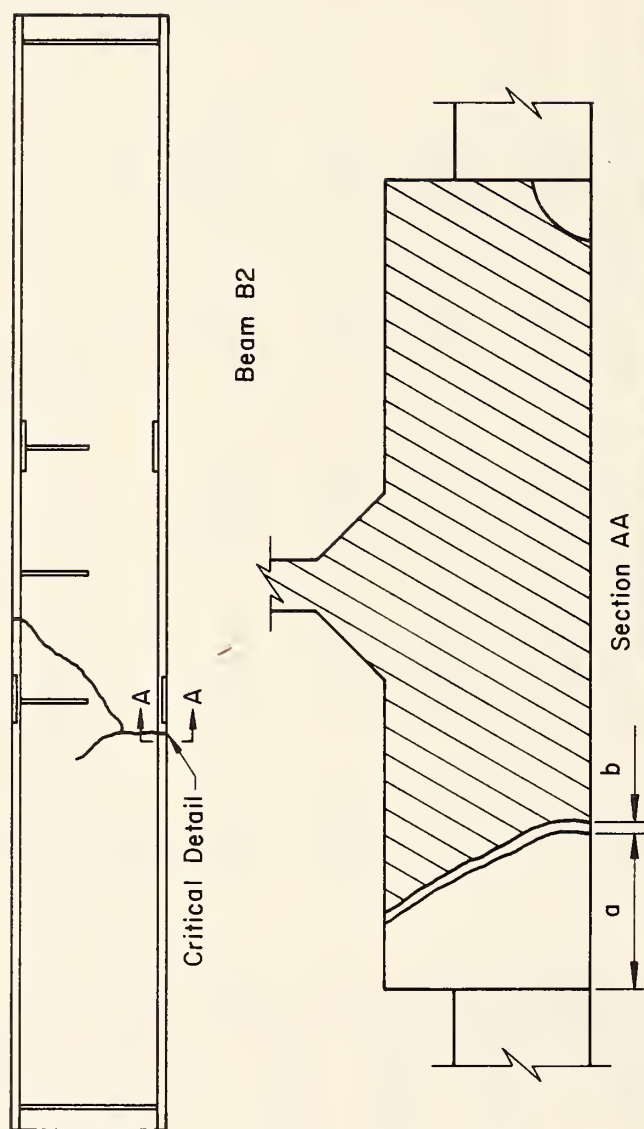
Fatigue and Fracture Surface, B2 (A514)
